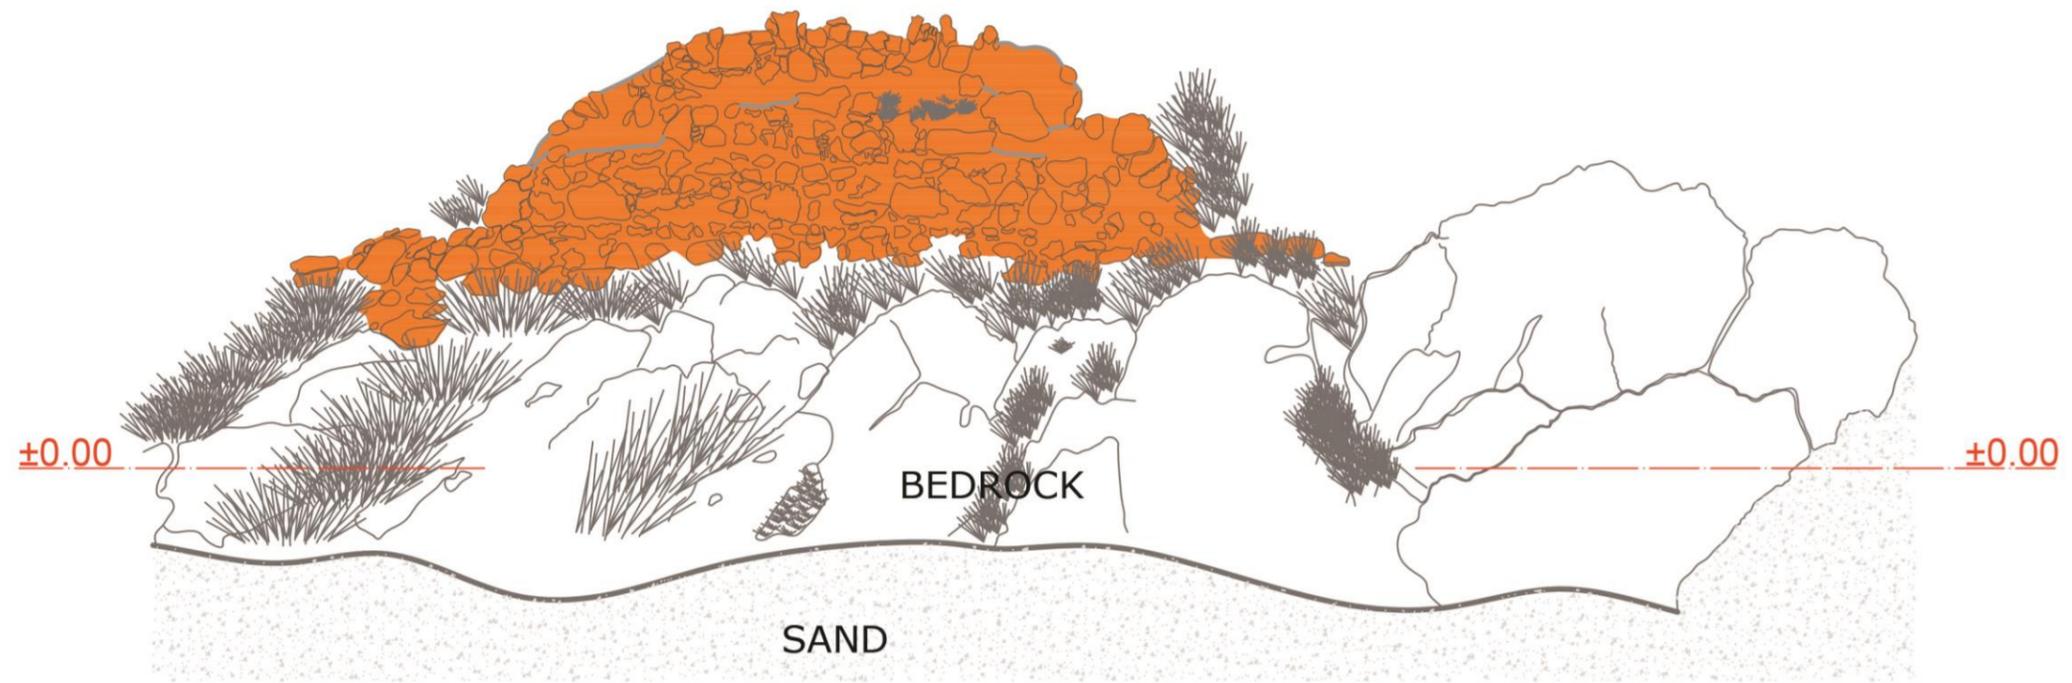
West Elevation - Construction Technique and Material Usage
